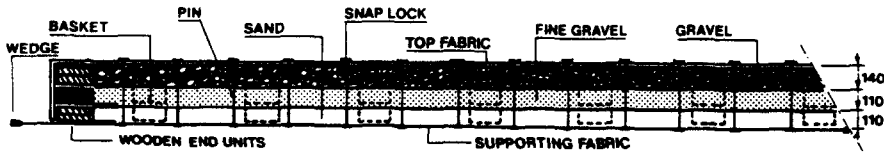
Oosterschelde storm surge barrier: filter mattress construction (dimensions in mm).⁶
